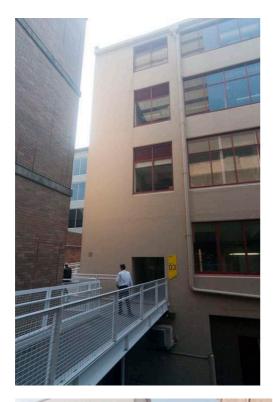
(Left) western elevation of the 1928 wing of the Bon Marche building with walkway entry into the building at left and adjacent building at left of walkway
